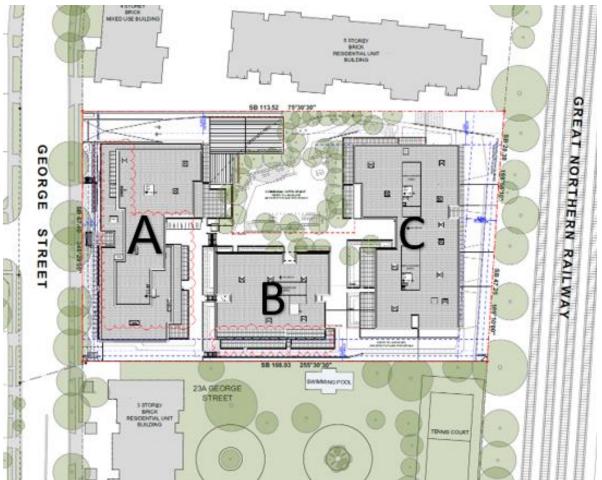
Site Plan Extract – Drawing No. DA007 (Revision I), prepared by Fuse Architects, dated 12/07/2024 – Showing location of Buildings A, B & C
